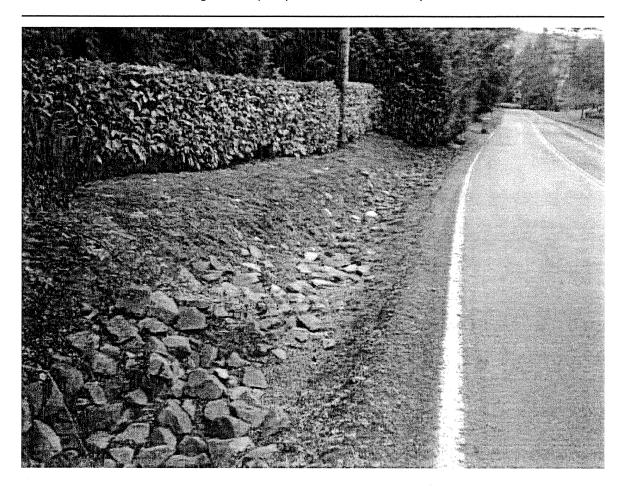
Looking southwest along SE 24th Way, near the SE 28th PL intersection.
